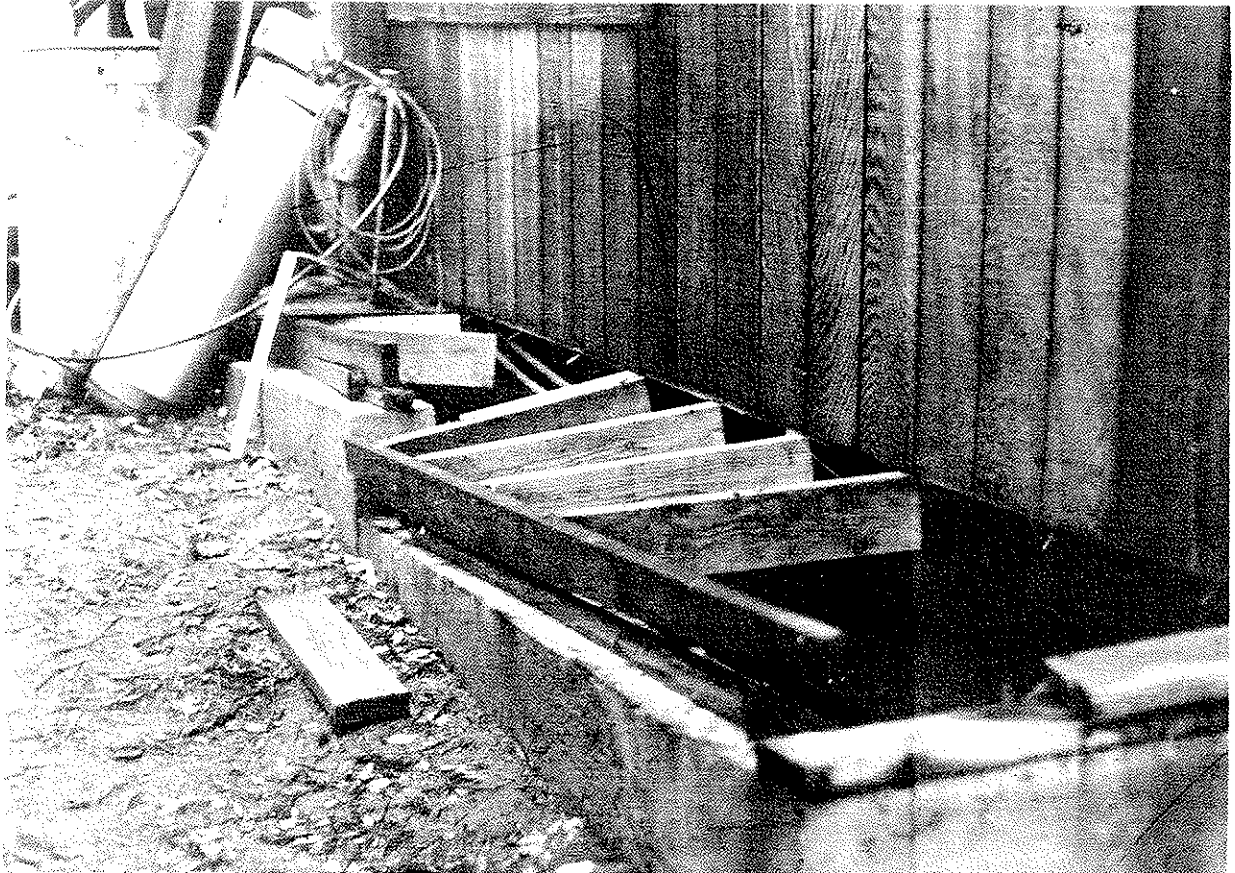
Collapsed cripple wall on house in Santa Cruz Mountains. Plywood sheathing on all cripple walls was inadequately fastened, allowing house to shift off foundation which split the sill plate along the bolt line.
